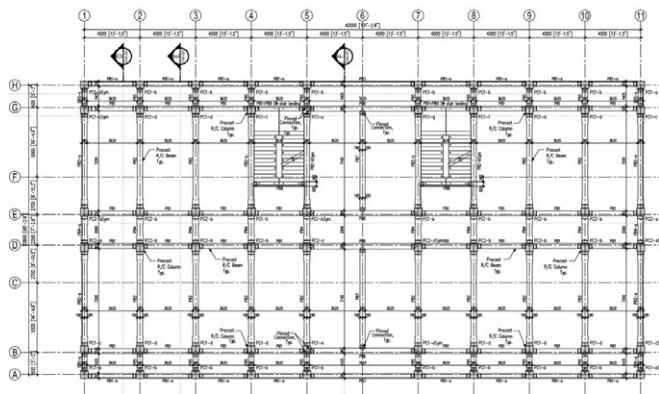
PLAN VIEW OF FRAMING SYSTEM FOR A TYPICAL FLOOR LEVEL
